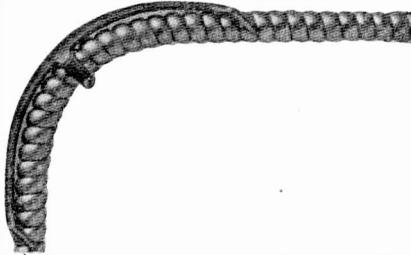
Use of Elbow Clamp for Fastening Flexible Conduit in Place.
